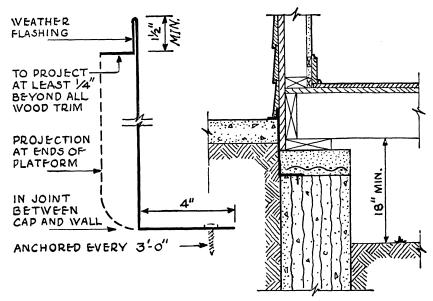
Metal apron inserted between concrete slab and woodwork, anchored to unit-type foundation, and capped with reinforced concrete. The apron serves as a weather flashing as well as a termite barrier.
